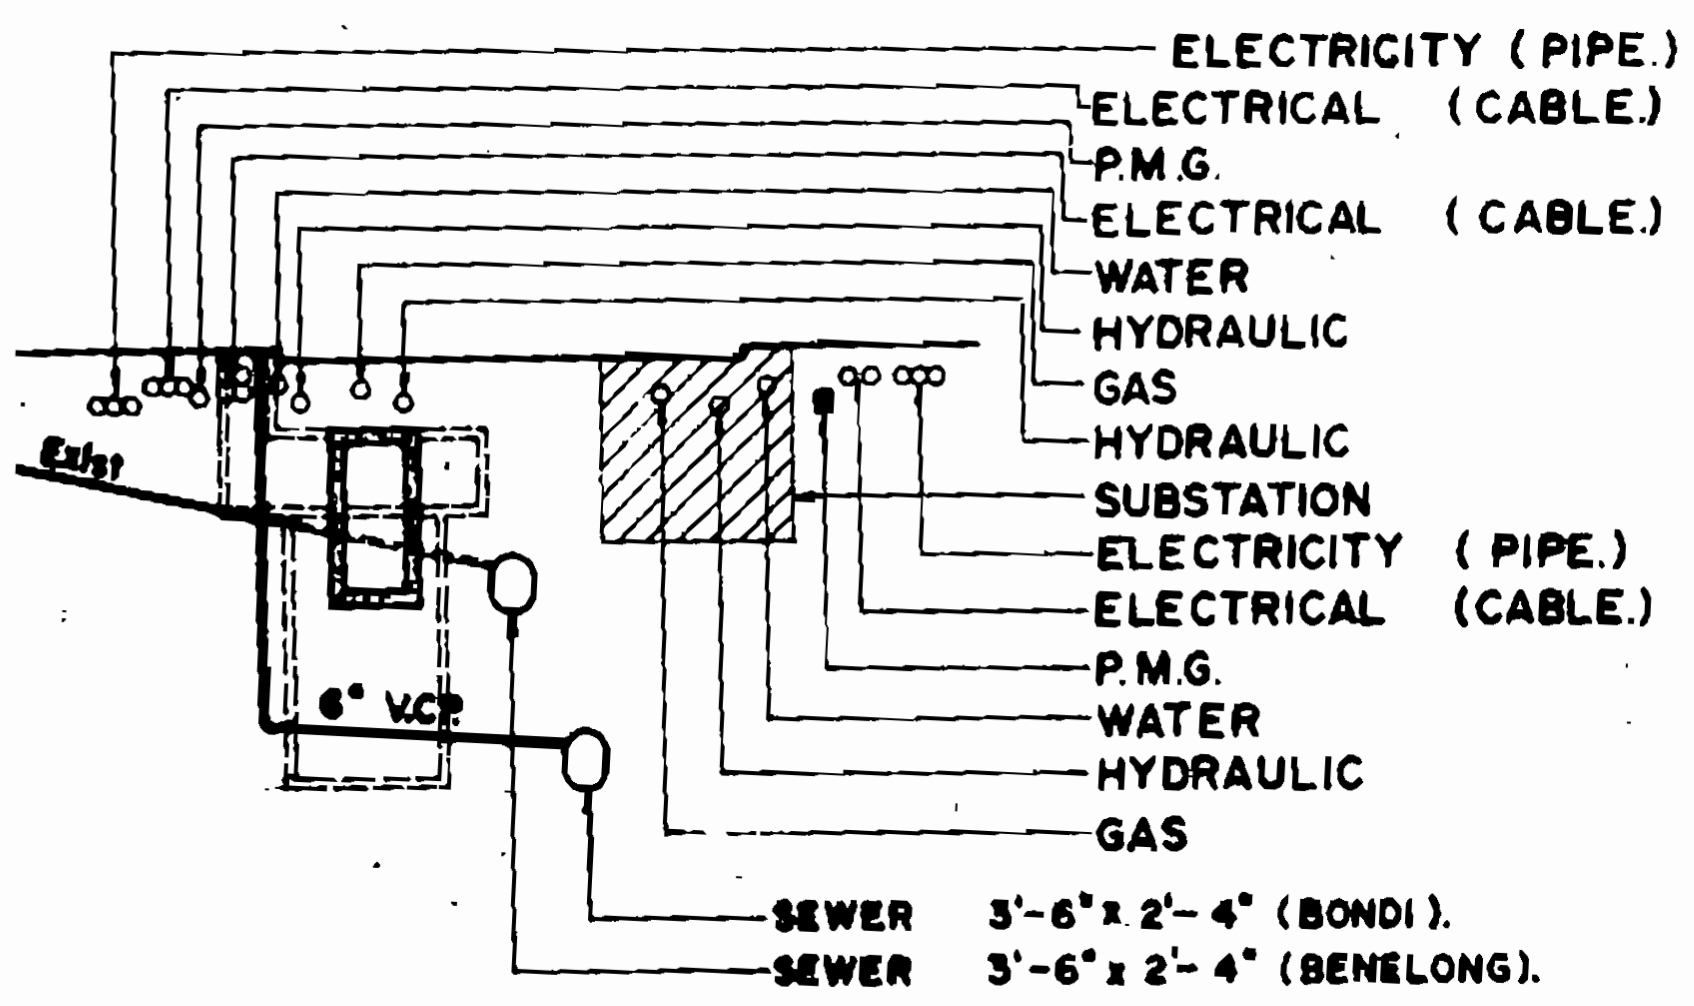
Typical Cross Section Castlereagh St. Tunnel.
